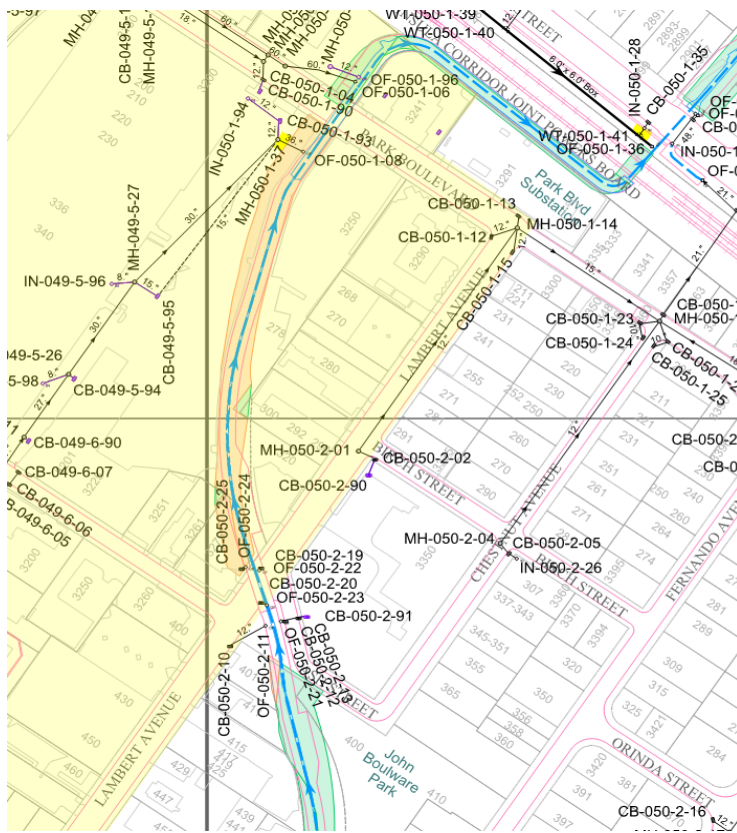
Storm Drain Outfalls to Matadero Creek Channel
